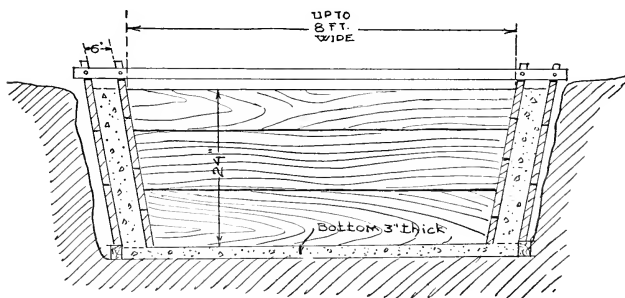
Section to show construction details of a small, formal pool of concrete. Unless the sides of the hole were dug accurately, it would usually be necessary to brace the wall forms on the outside as well as the inside, and at the bottom as well as the top
